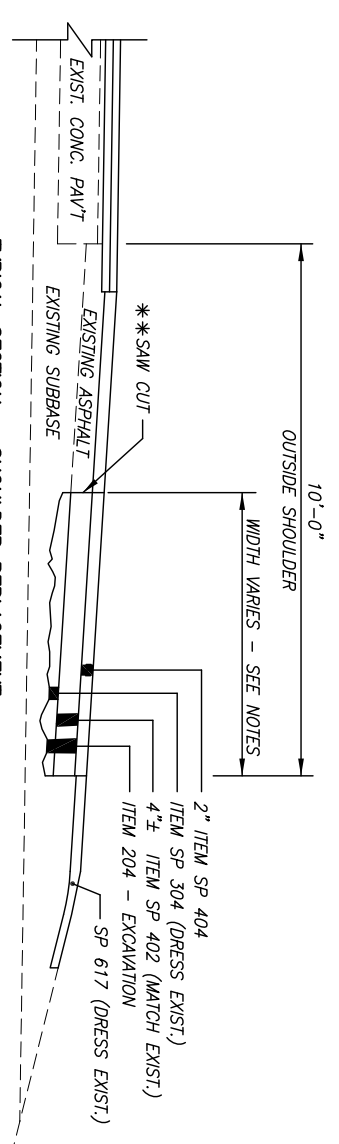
DETAIL 'A' - AT OUTSIDE EDGE OF PAVEMENT - NORMAL SECTION
